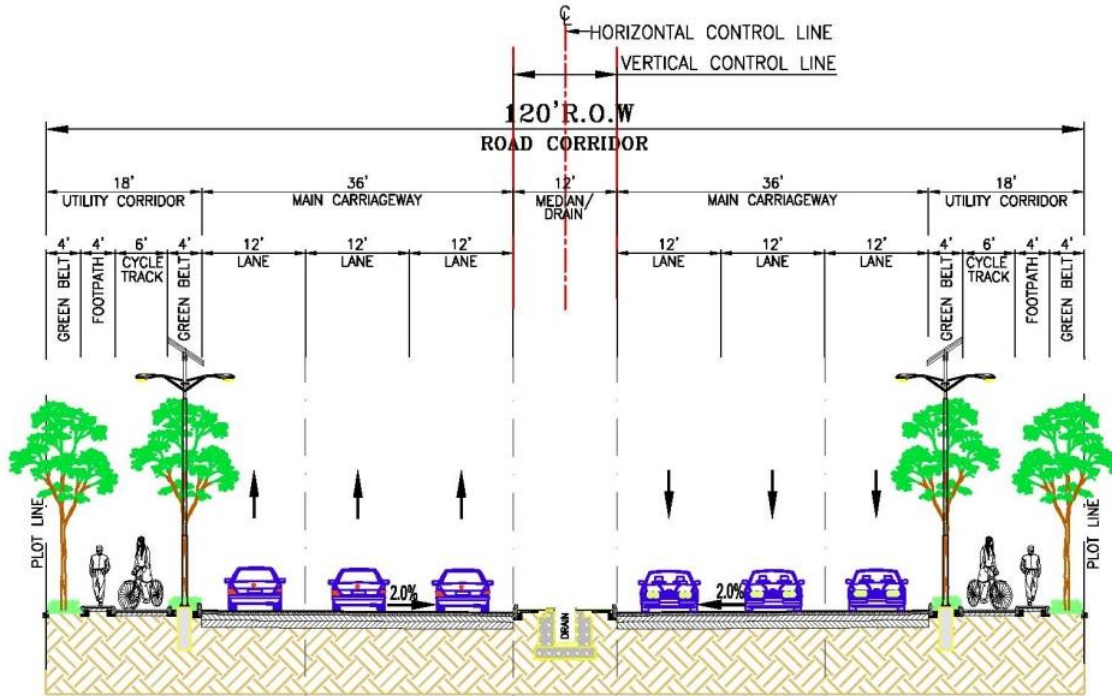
Proposed Cross Section for 120' ROW Faisalabad Bypass
